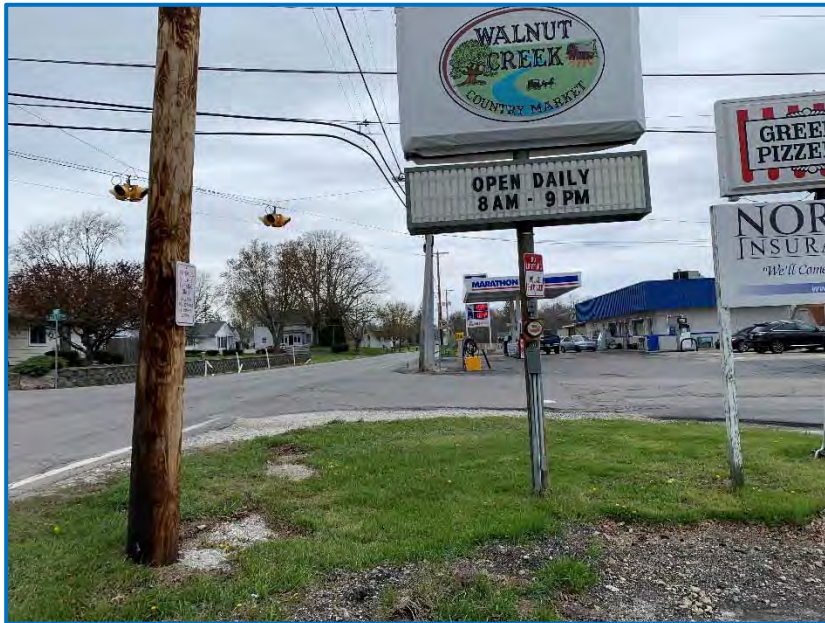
View of SR 22 and eastern roadside facing north towards the intersection with Bragg Avenue (04-22-20).
